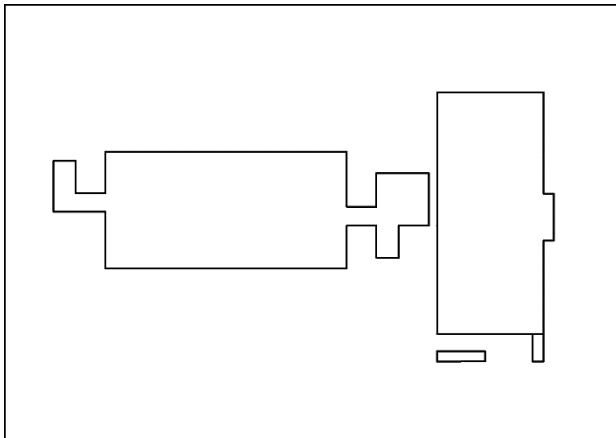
Example of a floor plan of a Brazilian Youth Prison - Form A
